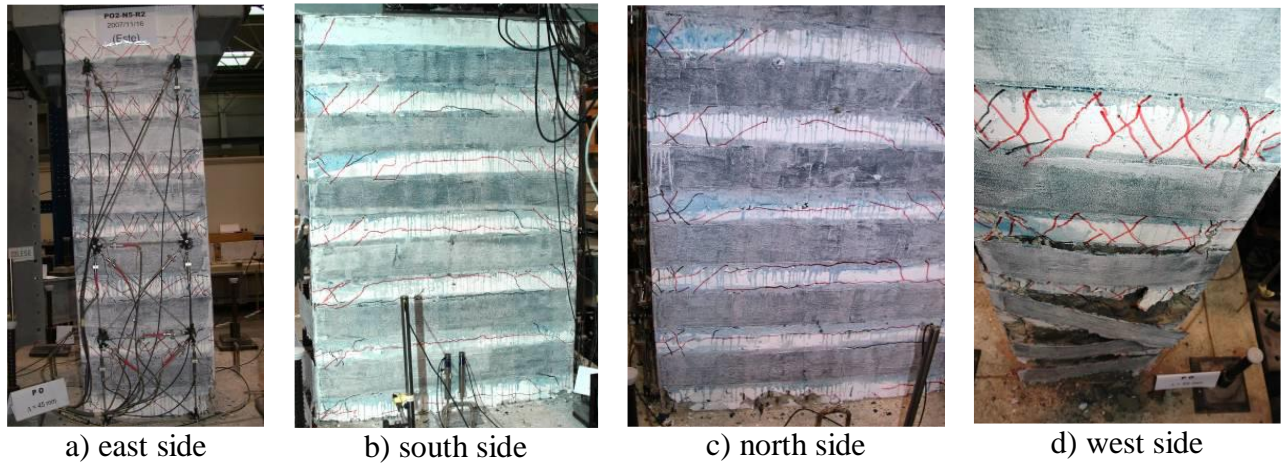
Final damage of pier PO2-N5-R2, for 2,9% drift.
